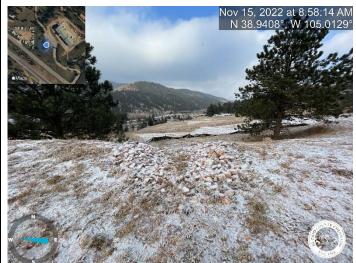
West detention pond; Emergency overflow path is not installed per detail. Provided detail on Sheet C2.9 shows that the path should measure 18' at the base.
